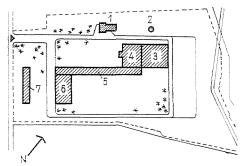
Lay-out of cardboard factory (Mayen): 1 - power station; 2 - paper-sludge basin; 3 - storehouse; 4 - preparatory workshop; 5 - machine-hall; 6 - storehouse; 7 - office
